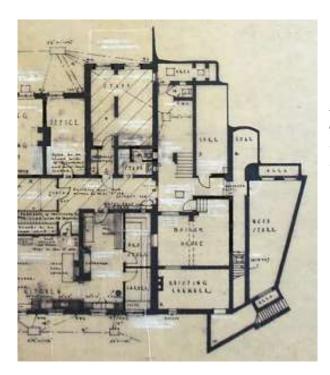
1953 Ground-floor plan, depicting the subterranean rooms to the west of the main house, and labelled as storage rooms.
